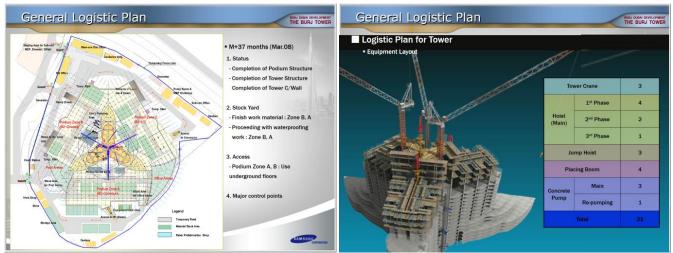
Logistics Plan for site for 37+ months and Plan for tower
